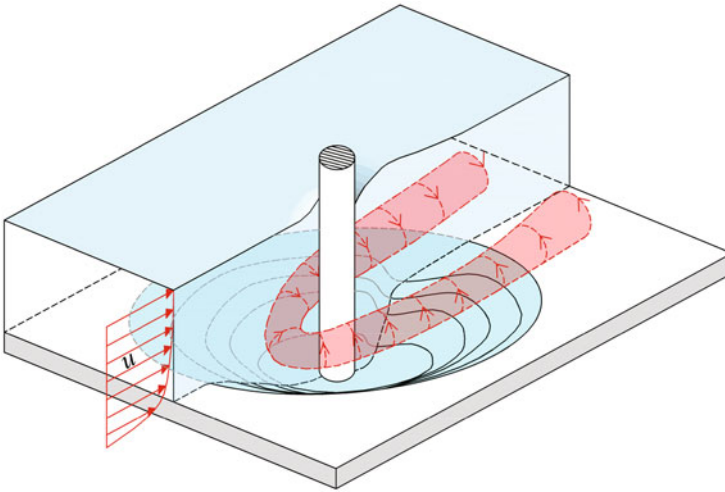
Layout of the horseshoe vortex near the localized scour of a bridge pier
